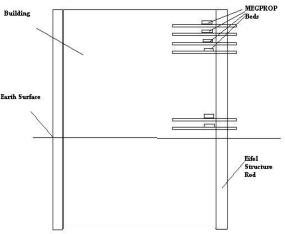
Cut section side view of building with MegEifel rod at side. MegEifel rods further have horizontal beams. Shells\MegProp beds resting on horizontal beams in normal condition are also shown.
